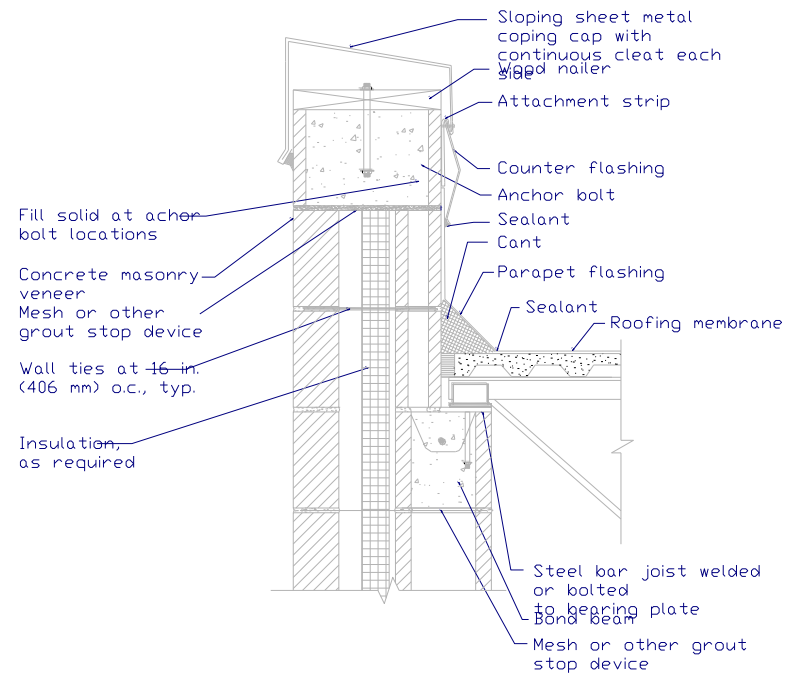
Typical Flat Roof and Exterior Masonry Cavity Wall
